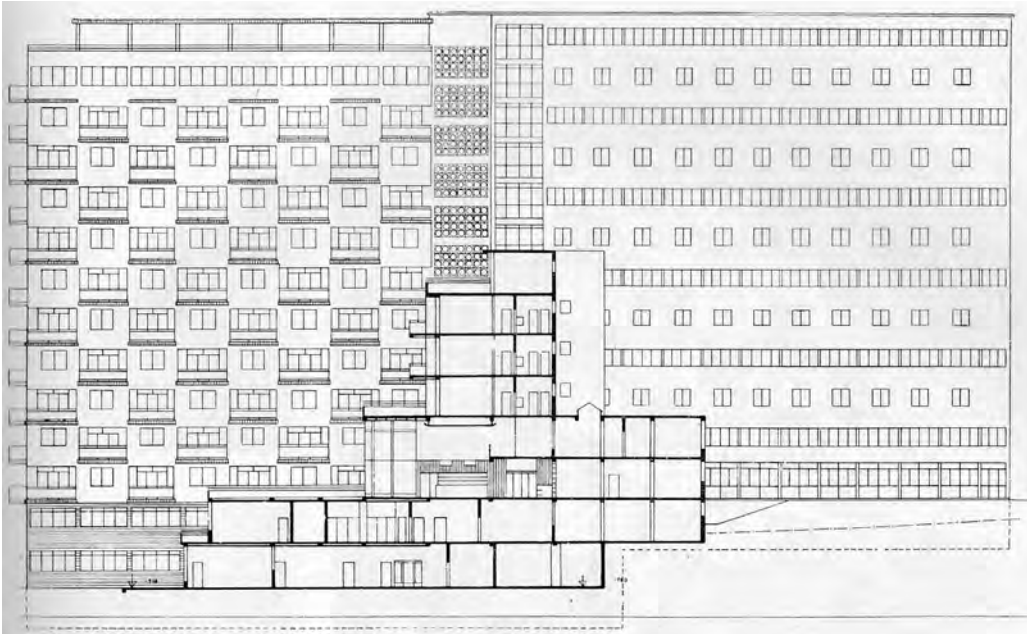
COLLECTIVE HOUSE, LITVÍNNOV, SECTION LOOKING WEST, 1946–1958.
